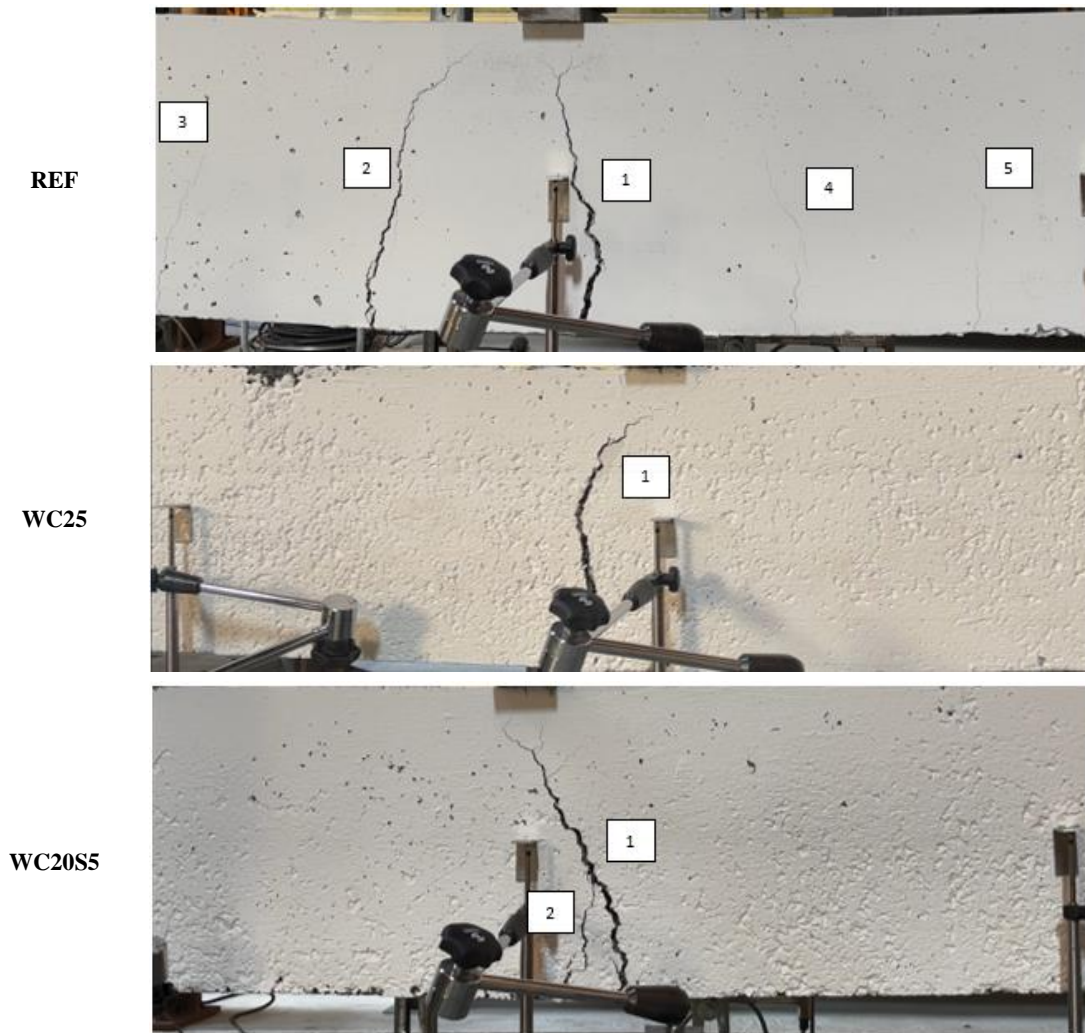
Crack development (pattern at the end of the test): REF crack 1 - 23 kN, crack 2 - 23 kN, crack 3 - 27 kN, crack 4 - 26 kN, crack 5 - 34 kN; WC25 crack 1 - 37 kN; WC20S5 crack 1 - 44 kN, crack 2 - 45 kN.
